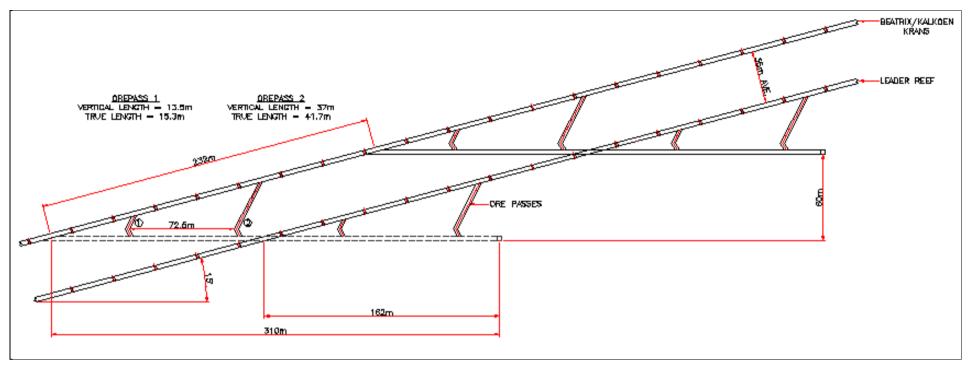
Section through stope showing stope ore passes connecting to crosscut development
